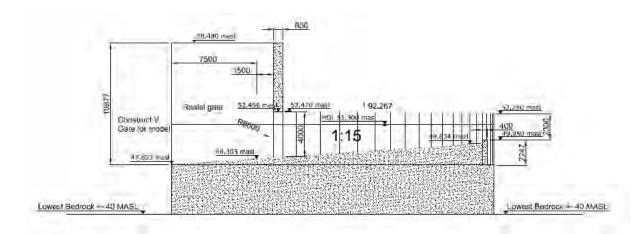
Proposed BRVAS abstraction works section F-F (Boulder trap)
